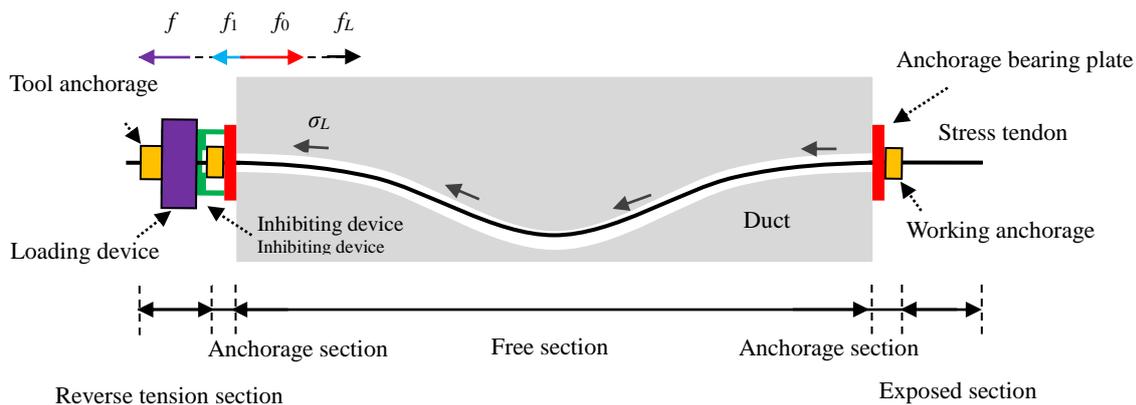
Schematic diagram of reverse tension method in PC bridge anchorage structure
